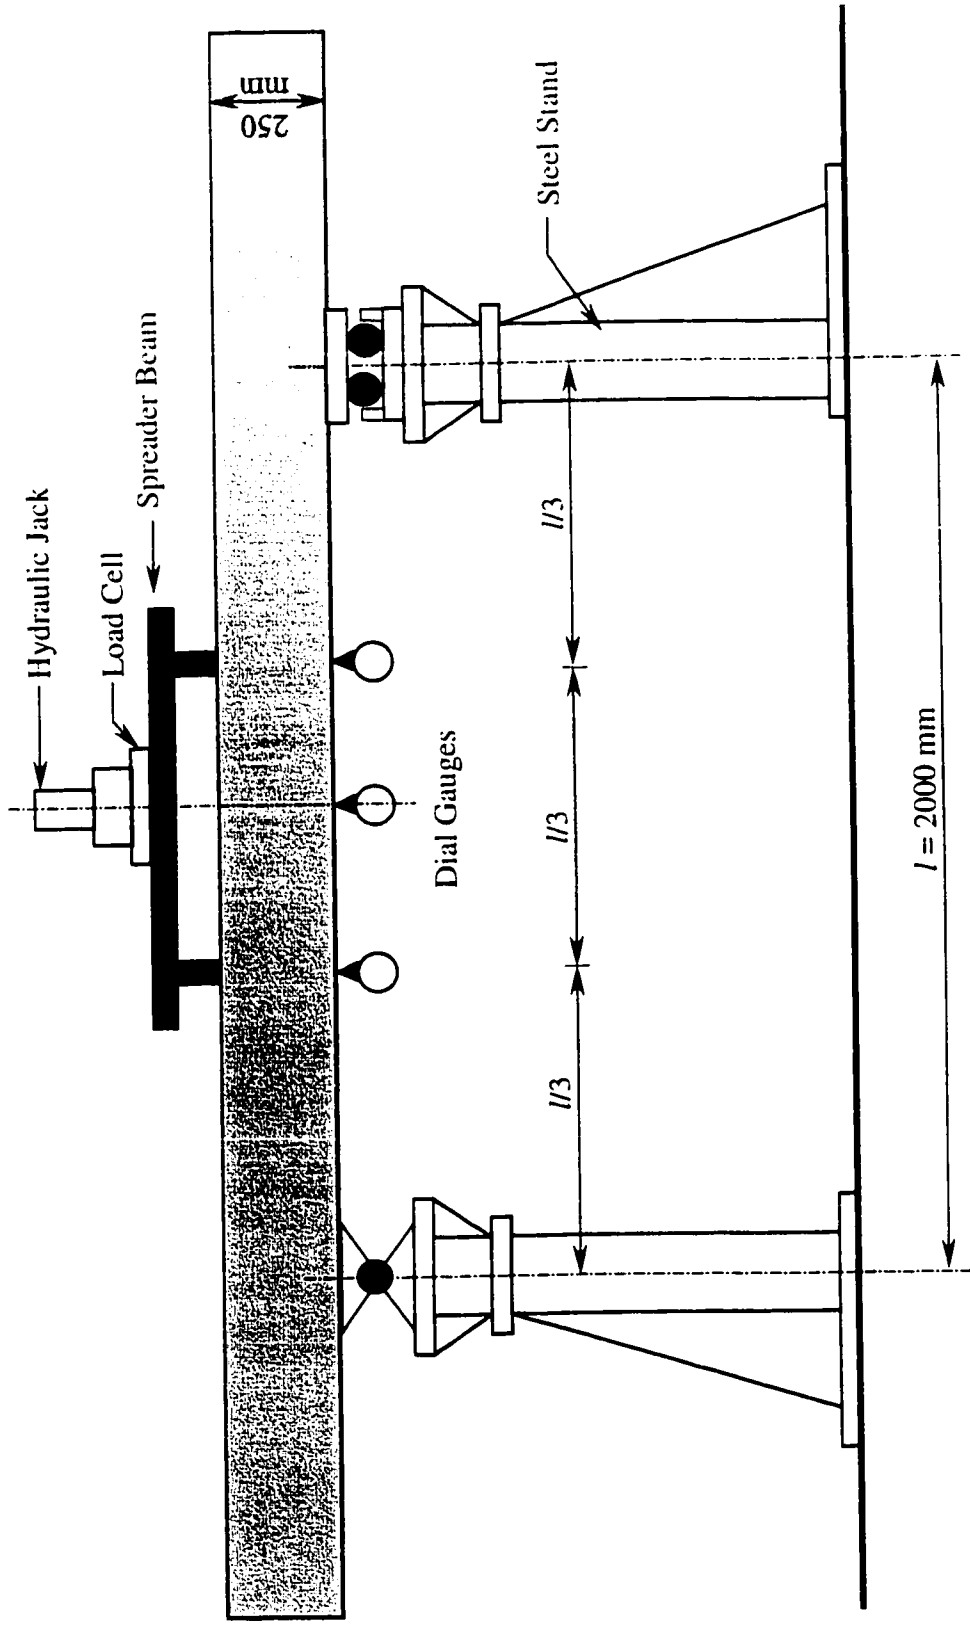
Schematic View of Mechanical Loading Test Set-up
